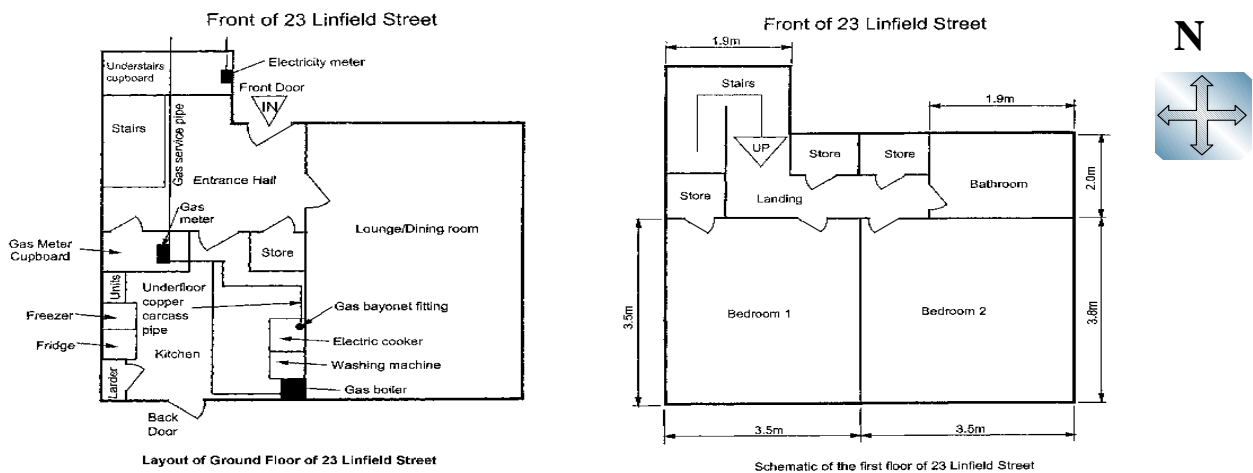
Layout of Ground Floor and First Floor at No 23 Linfield St.
